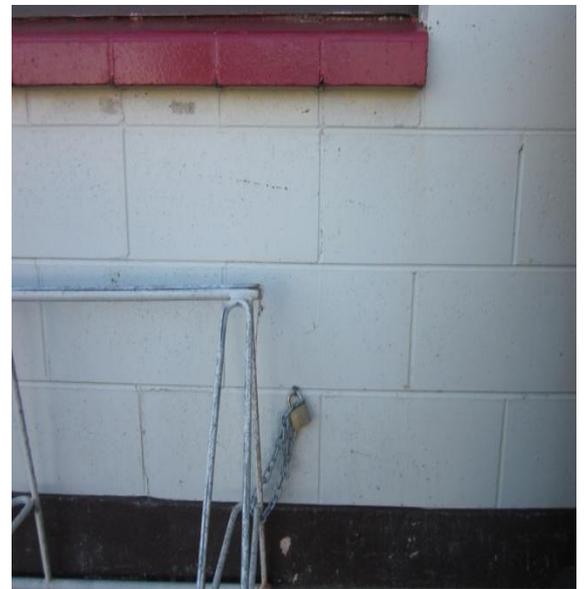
Existing stepped cracking on the exterior of the perimeter walls
